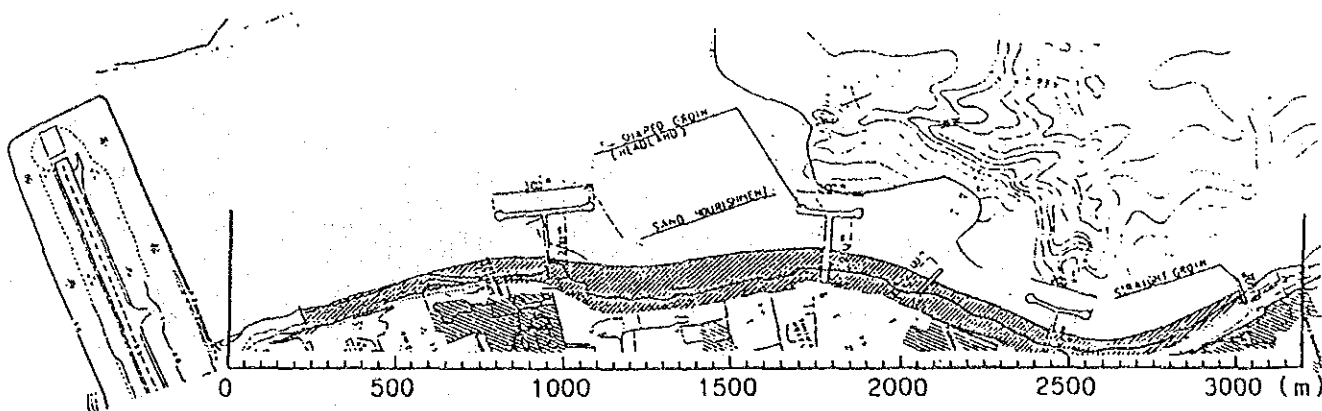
Proposed Plan 1 (Kuta)
